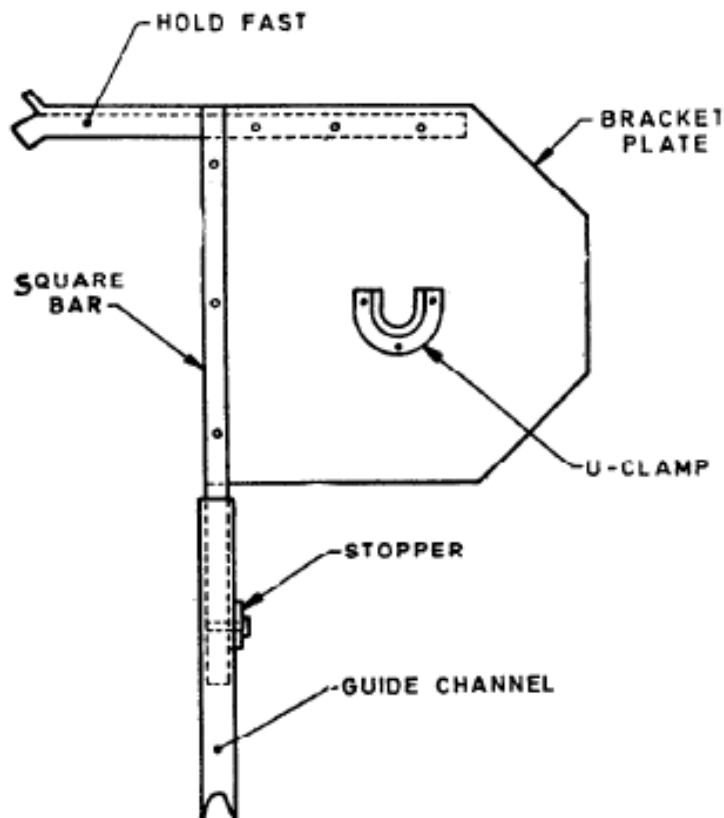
DETAILS OF SQUARE BAR FIXTURE
